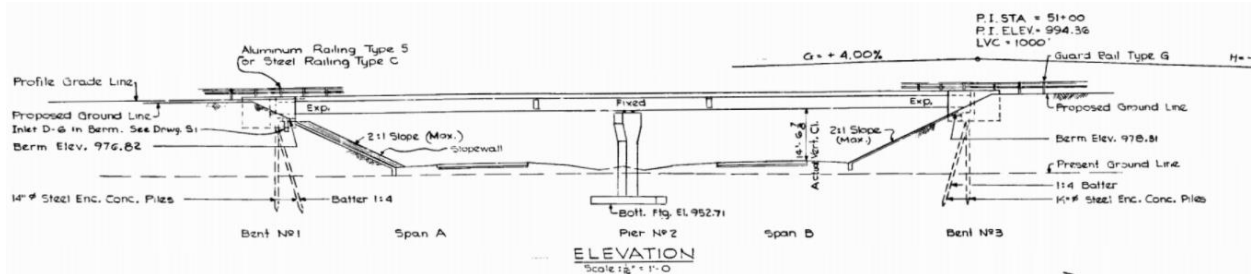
Elevation View of the Bridge (NBI 24210) (1971)
